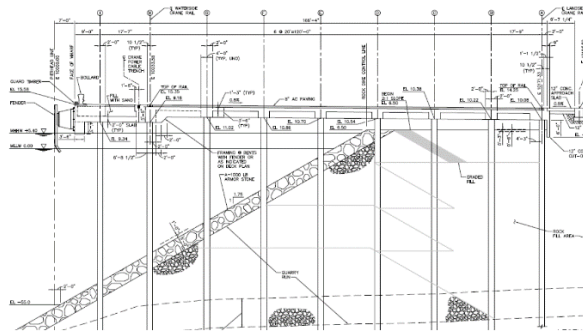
Typical Wharf Cross-Section (source: The Port of Long Beach)
